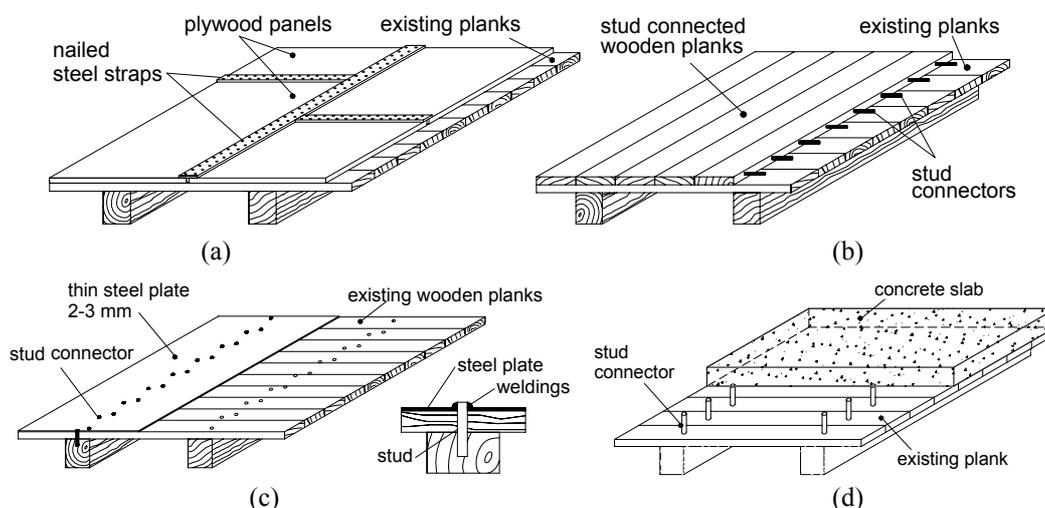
Wooden floor in plane shear strengthening by means of (a) plywood panels; (b) stud connected wooden planks; (c) thin steel welded plates; (d) thin concrete slab.
